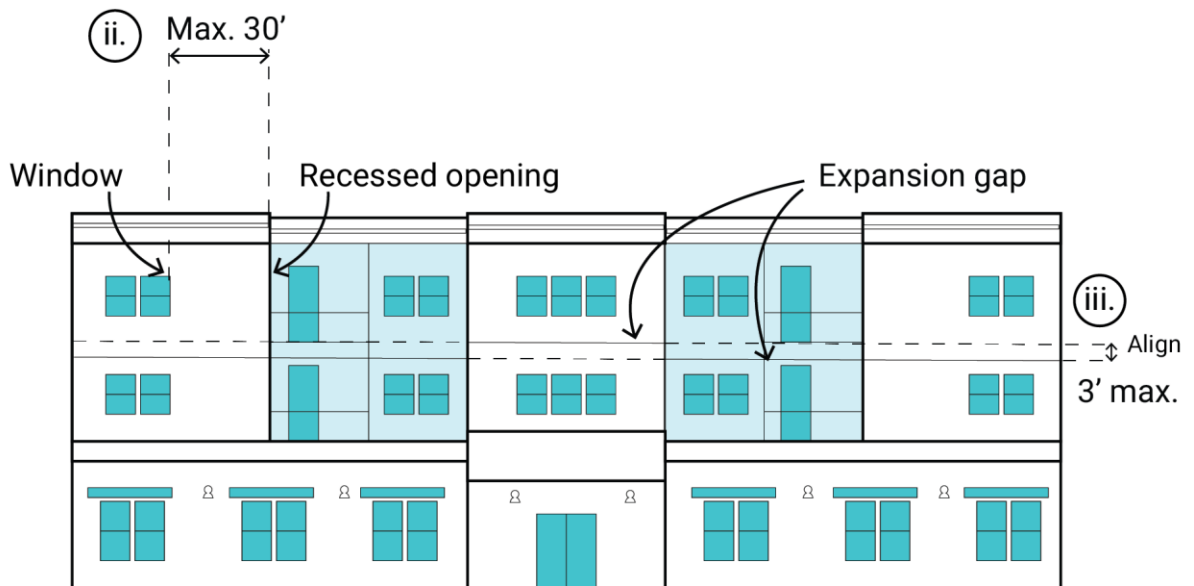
(B)(5)(a)(iii): Building element alignment
